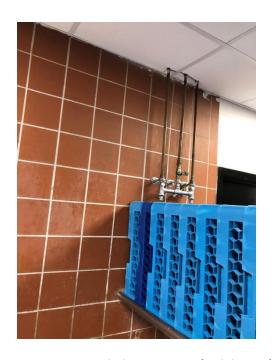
Existing Hose Reel Mixing Valve
